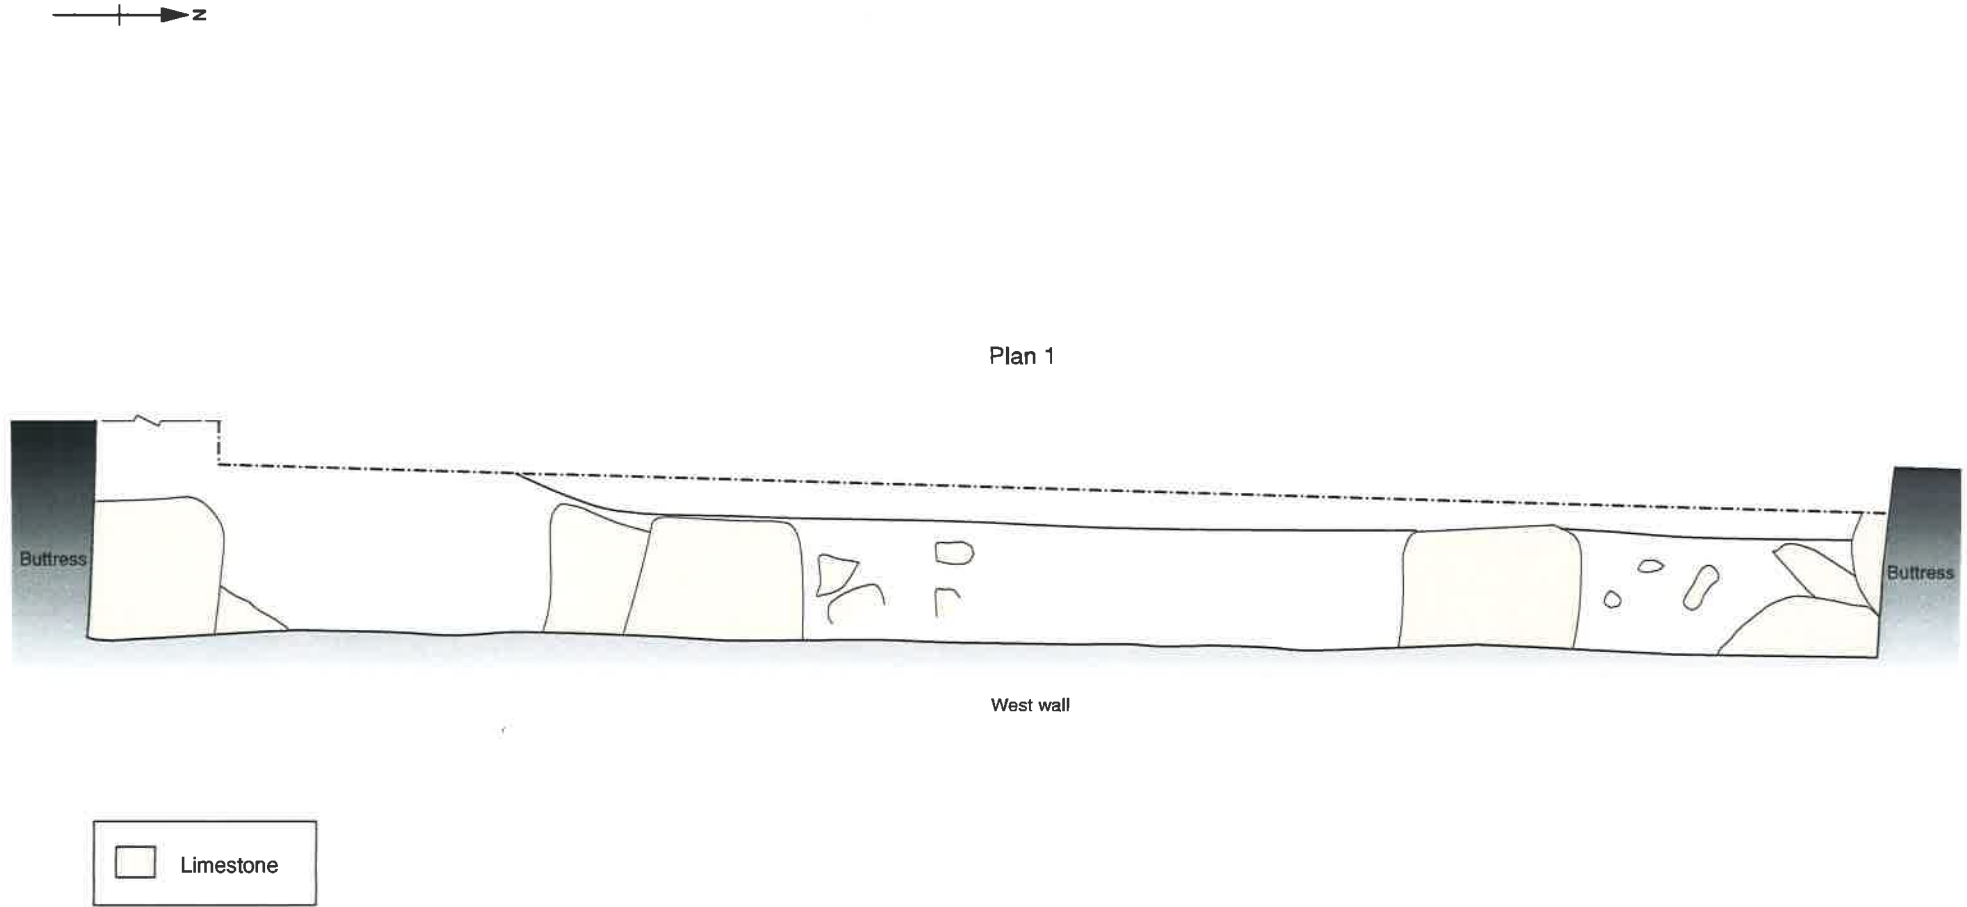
Saint Laurence's Church West Challow, Plan of West End
